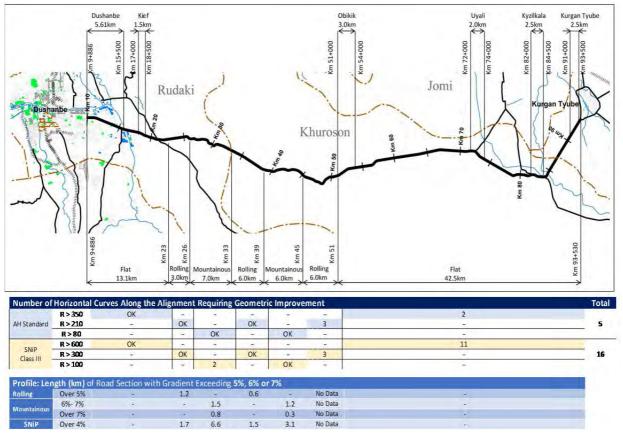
EXISTING HORIZONTAL ALIGNMENT AND VERTICAL PROFILE ISSUES OF DK ROAD
